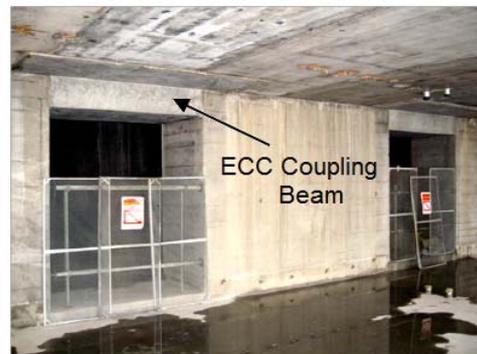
ECC coupling beams for a 60-story reinforced concrete building – Osaka (Japan) [24]
